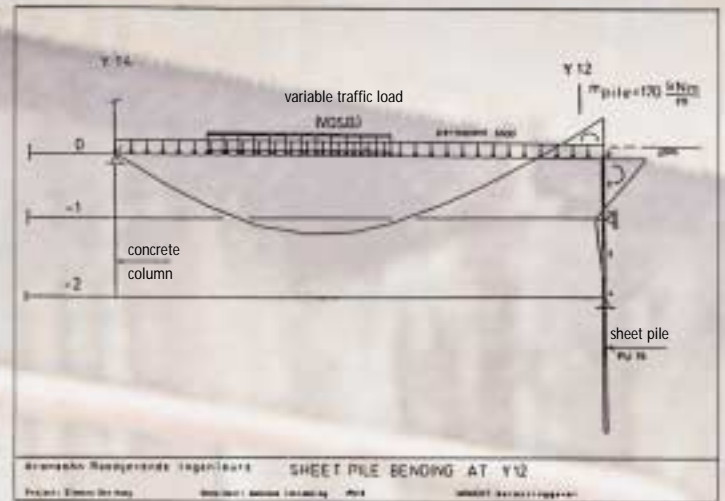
Sheet pile bending at Y12 due to variable traffic load
